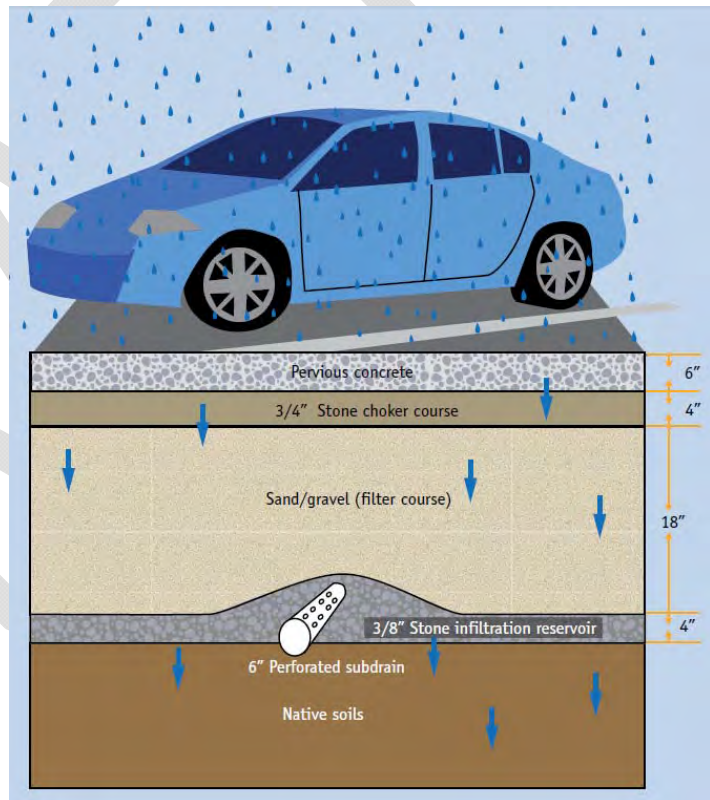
Porous pavement cross-section (Source: UNHSC, 2012).
